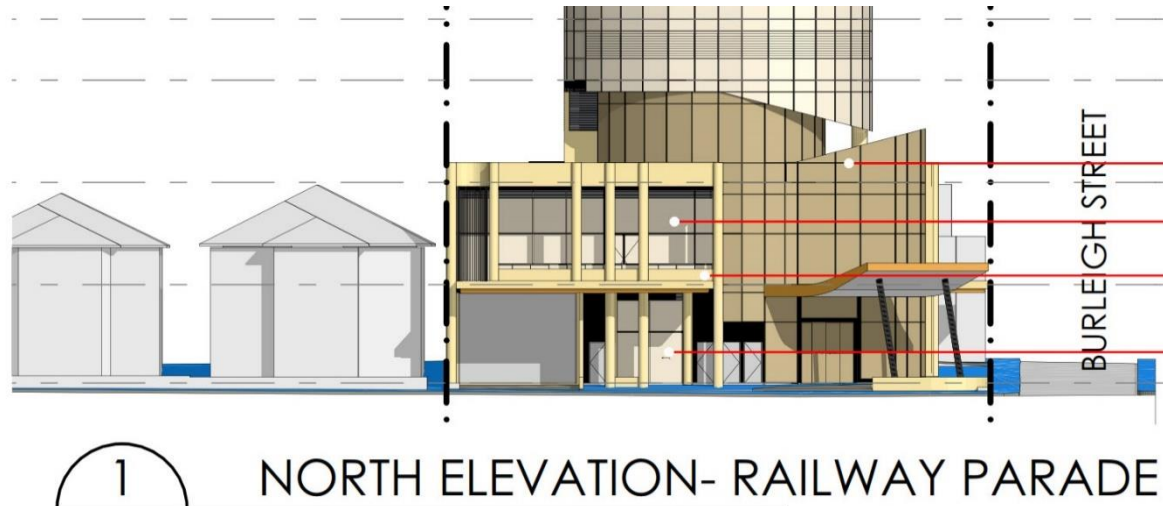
Street Elevations on Railway Parade and Burleigh Street.
